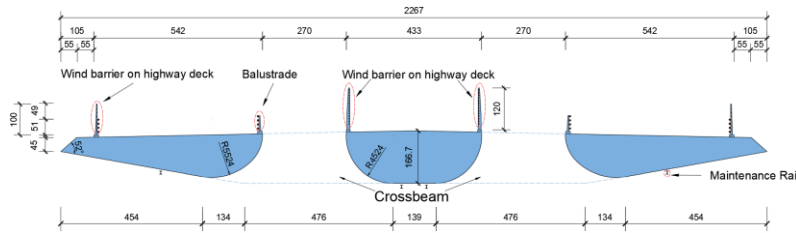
Scheme diagram of the 3-box girder cross-section in the 1:30 model (unit: mm)
